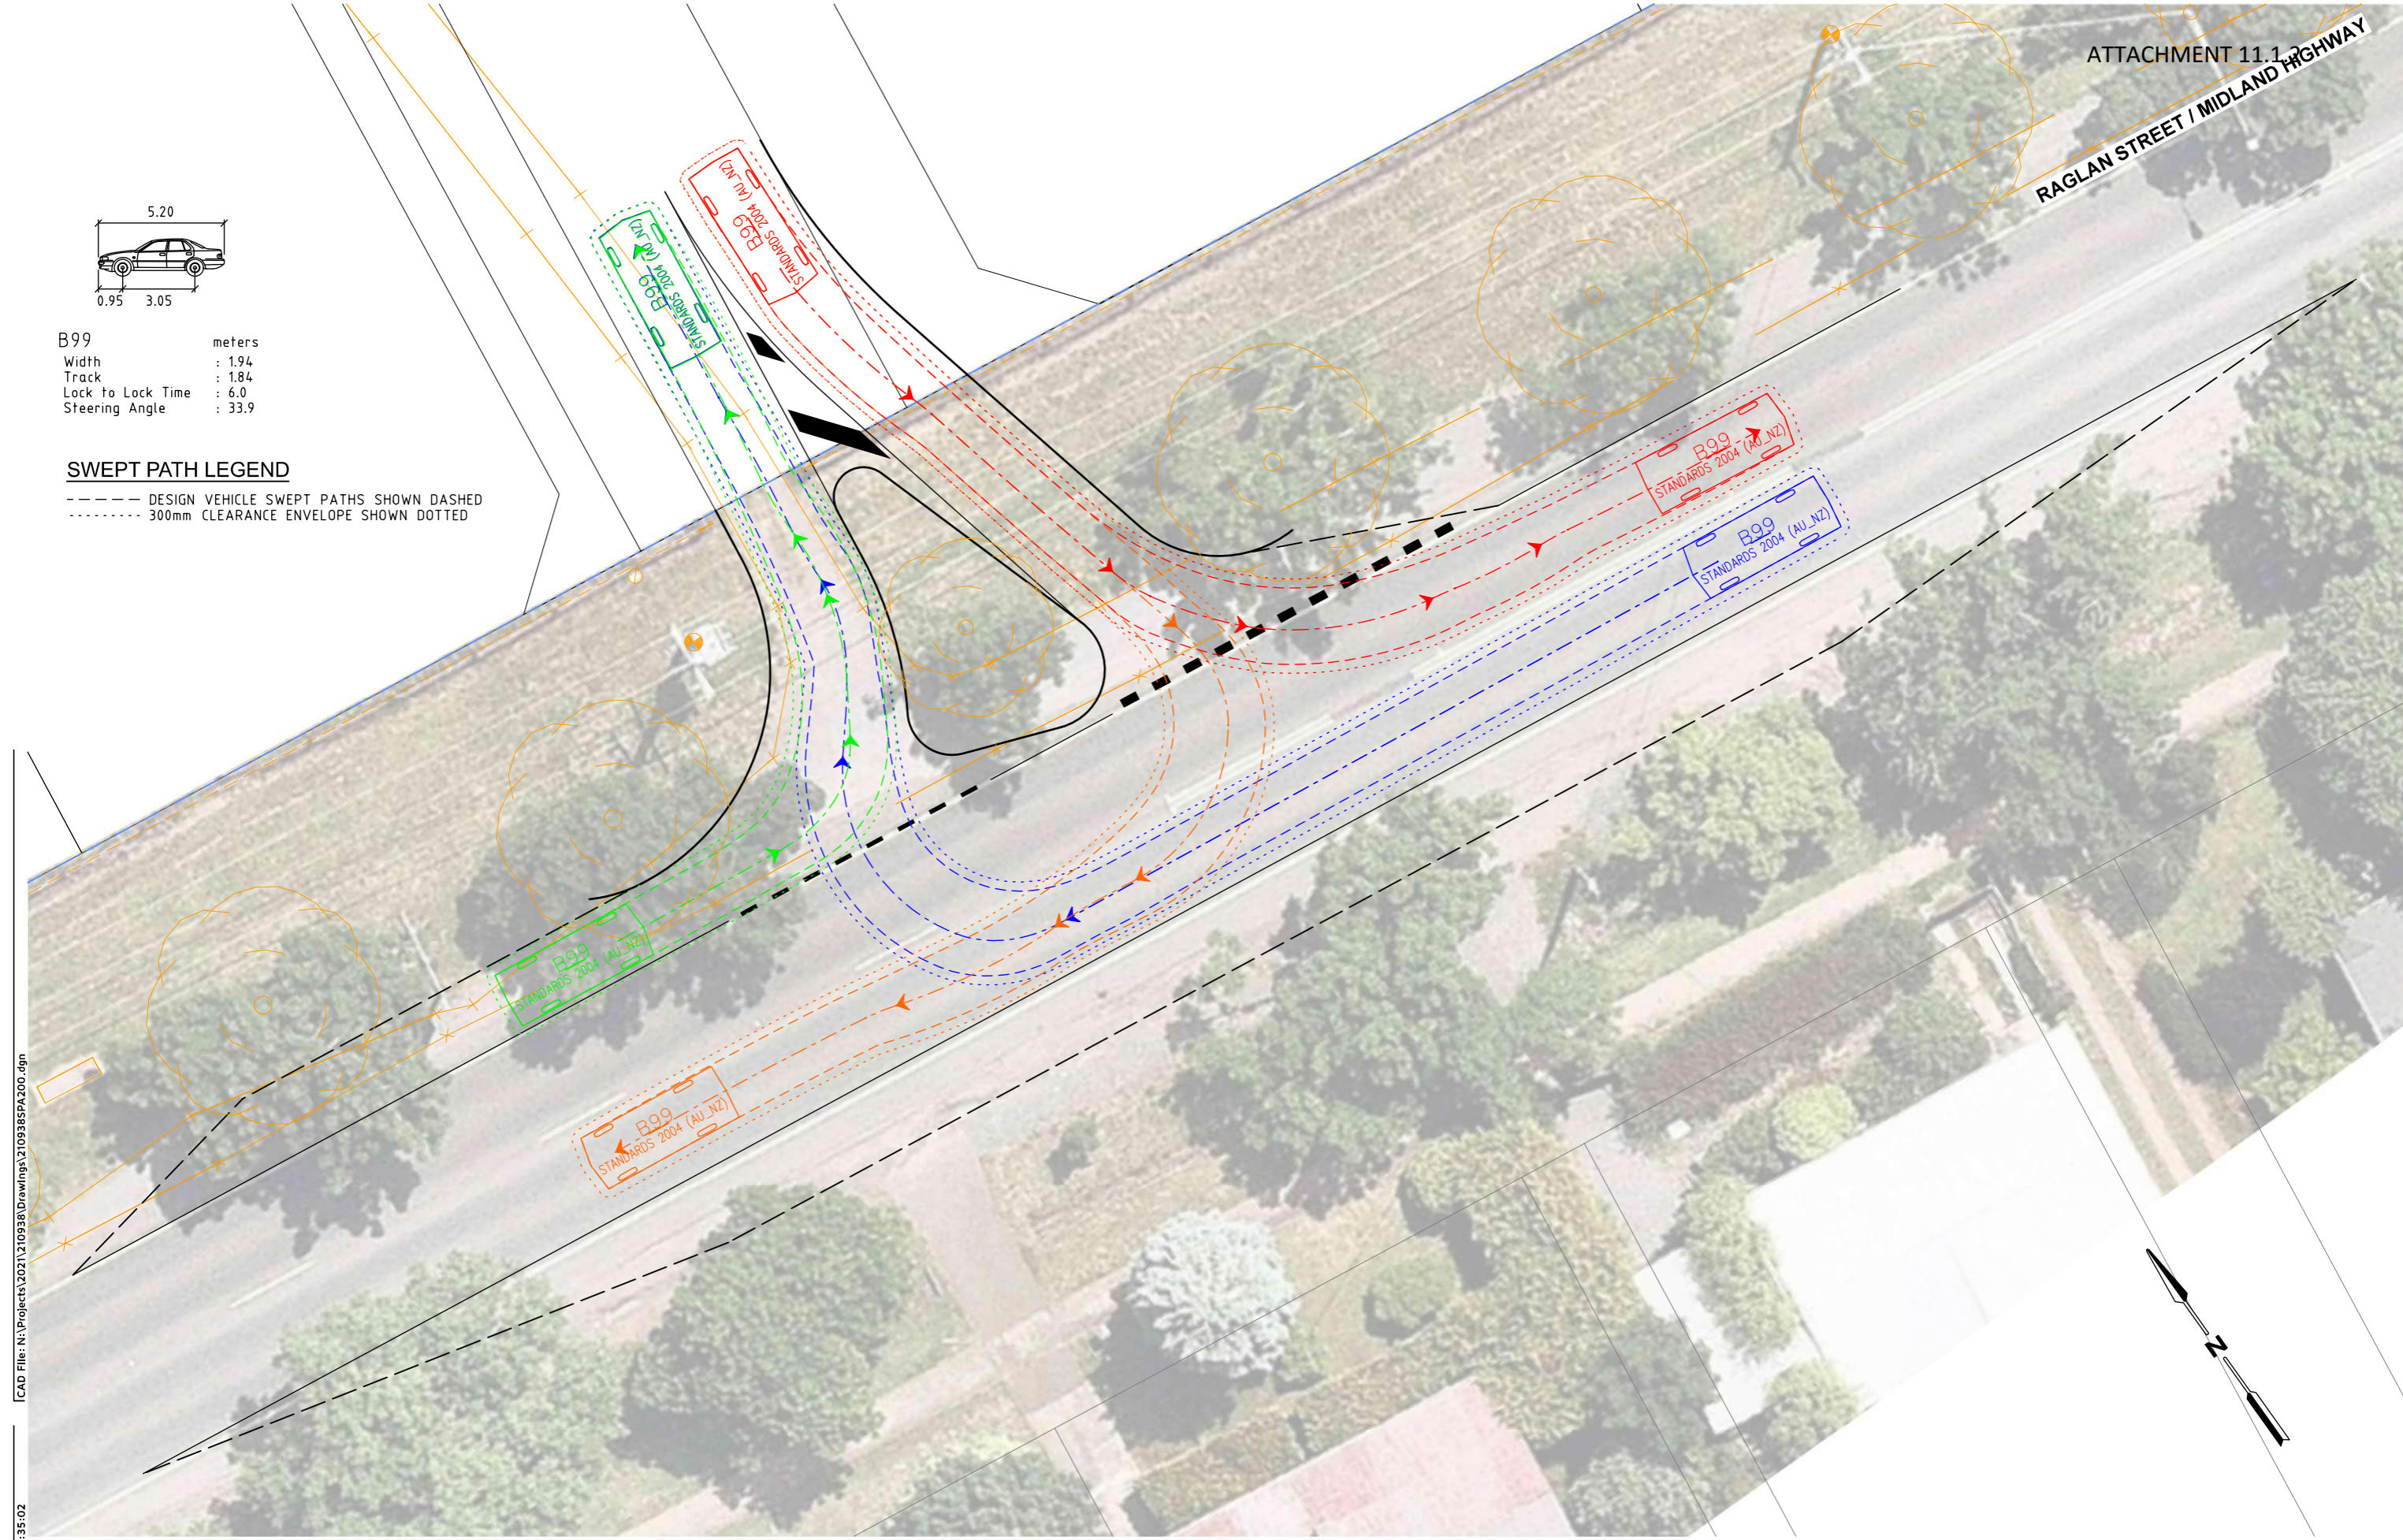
RAGLAN STREET, DAYLESFORD PROPOSED INTERSECTION CONCEPT LAYOUT PLAN
